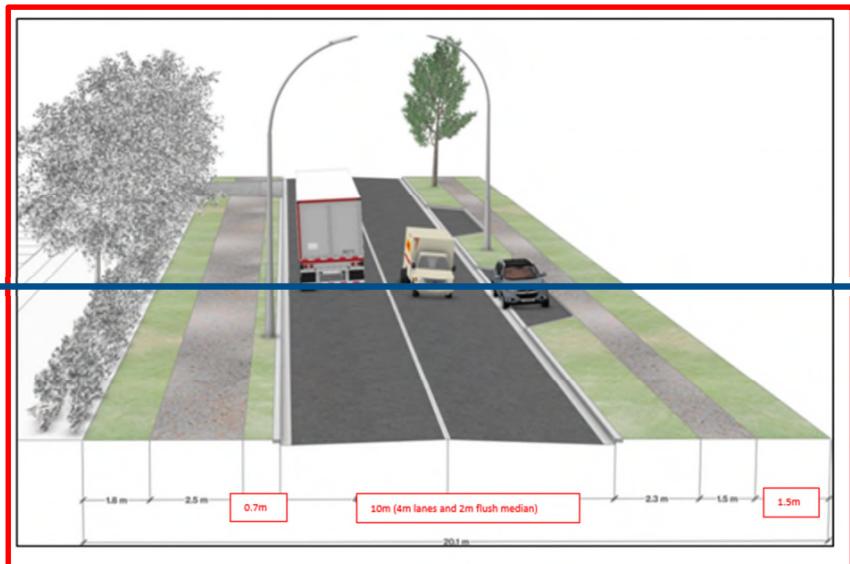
c: Indicative Cross-Section of the Te Rapa Structure Plan Spine Road (Collector)
